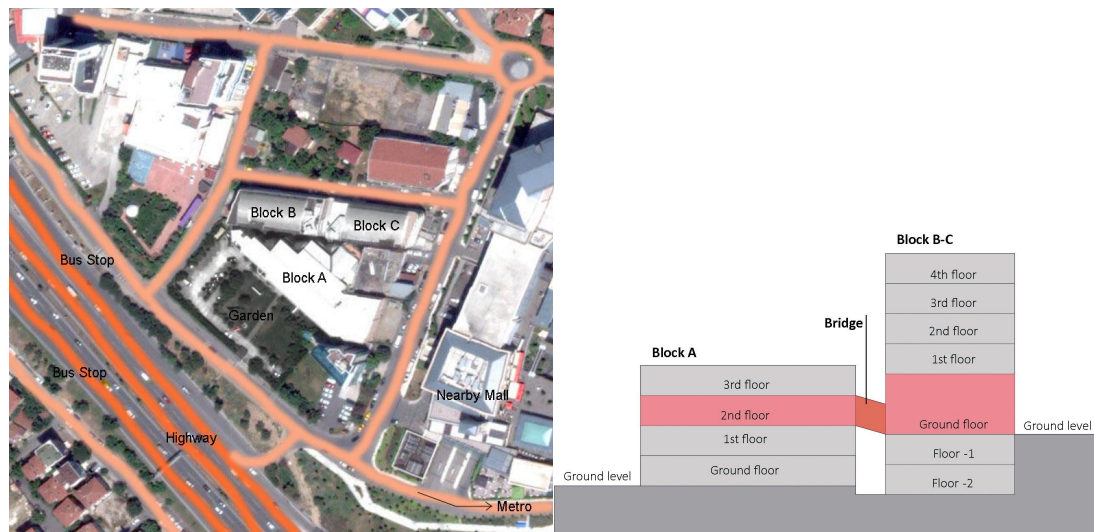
Master Plan (Google Maps) and the section of buildings. The section shows the connection between buildings
